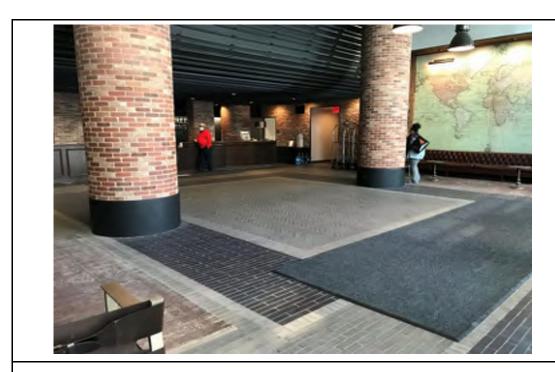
First floor concrete slab covered in brick/tile within the lobby, facing west. 30 March 2021.
